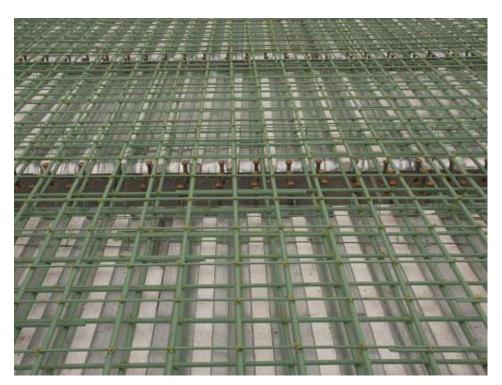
Deck reinforcement of I-75 over Fort Street
